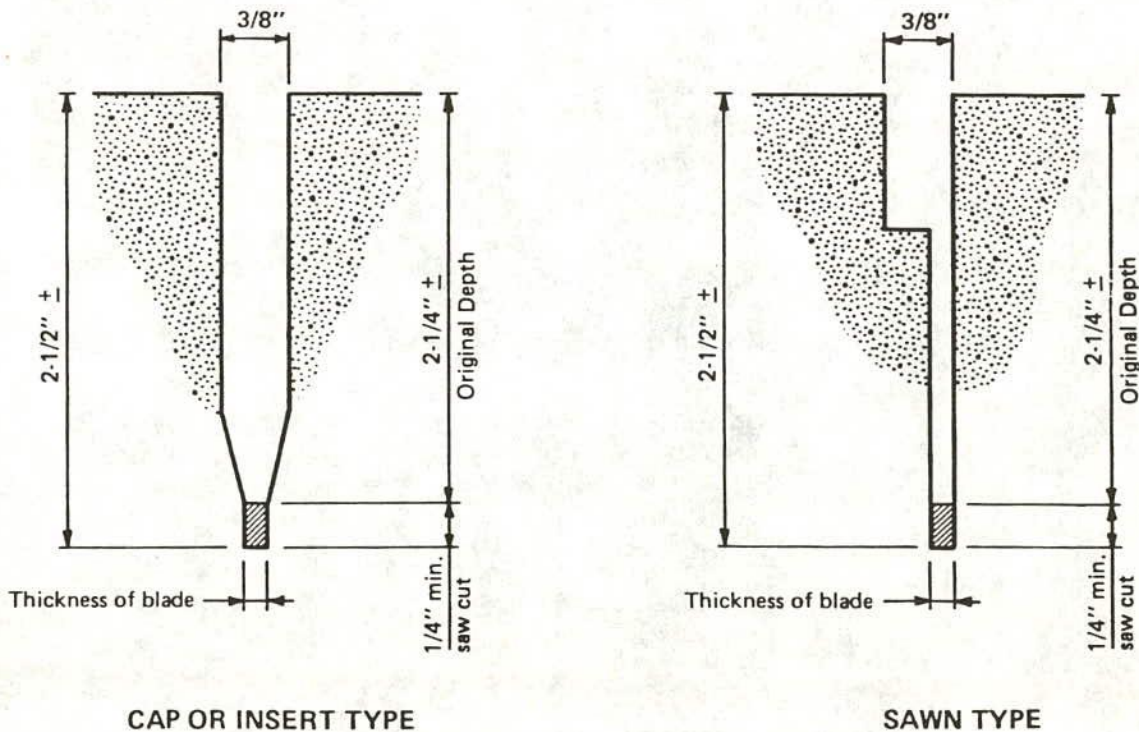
5-791.074 - Joint after joint material is removed and first saw cut is made using 14" blade.
